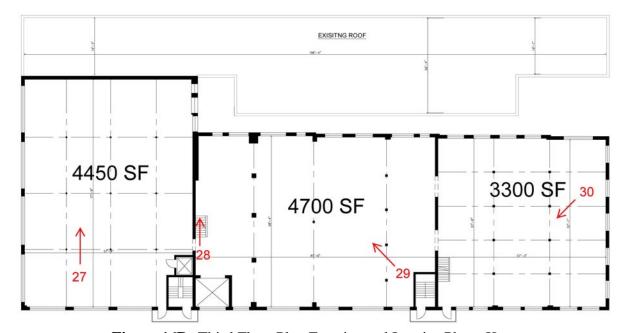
D: Third Floor Plan Exterior and Interior Photo Key.
